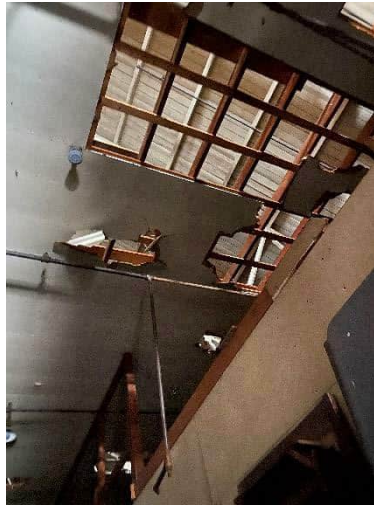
Extensive roof leaks and mold throughout Building 12B, which is filled with old desks, chairs, partitions and kitchen equipment.
